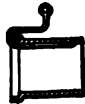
Hook for Lowering and Placing Sewer Pipe.
